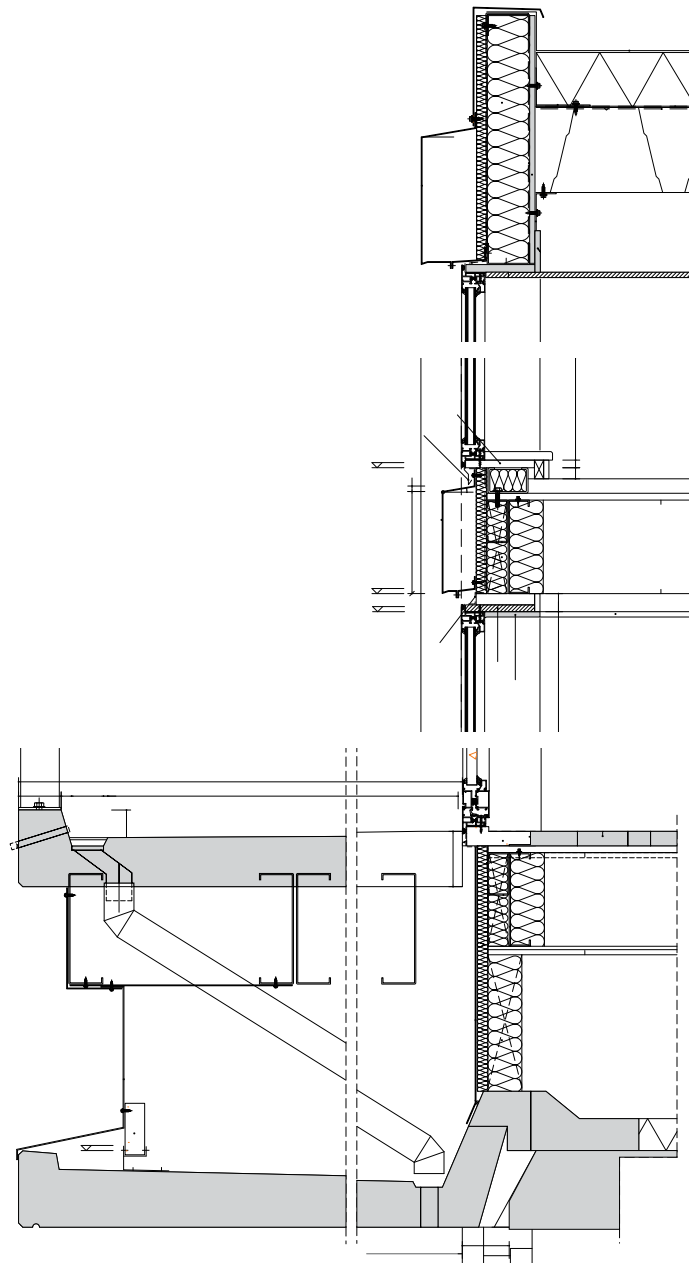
Detailed section through front facade of top-up (ter Borch, 2007)
